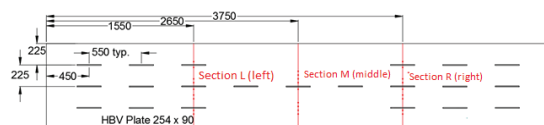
Plan view of the layout of the steel plate shear connectors in a typical TCC floor assembly
